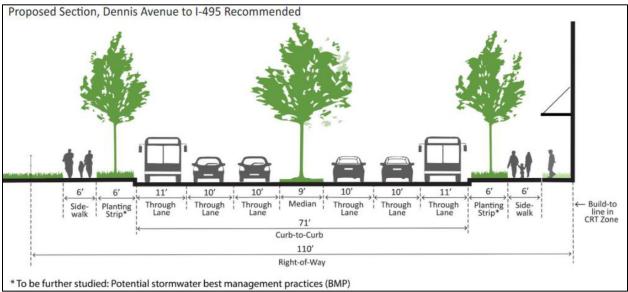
Georgia Avenue Section in 2020 Forest Glen/Montgomery Hills Sector Plan
